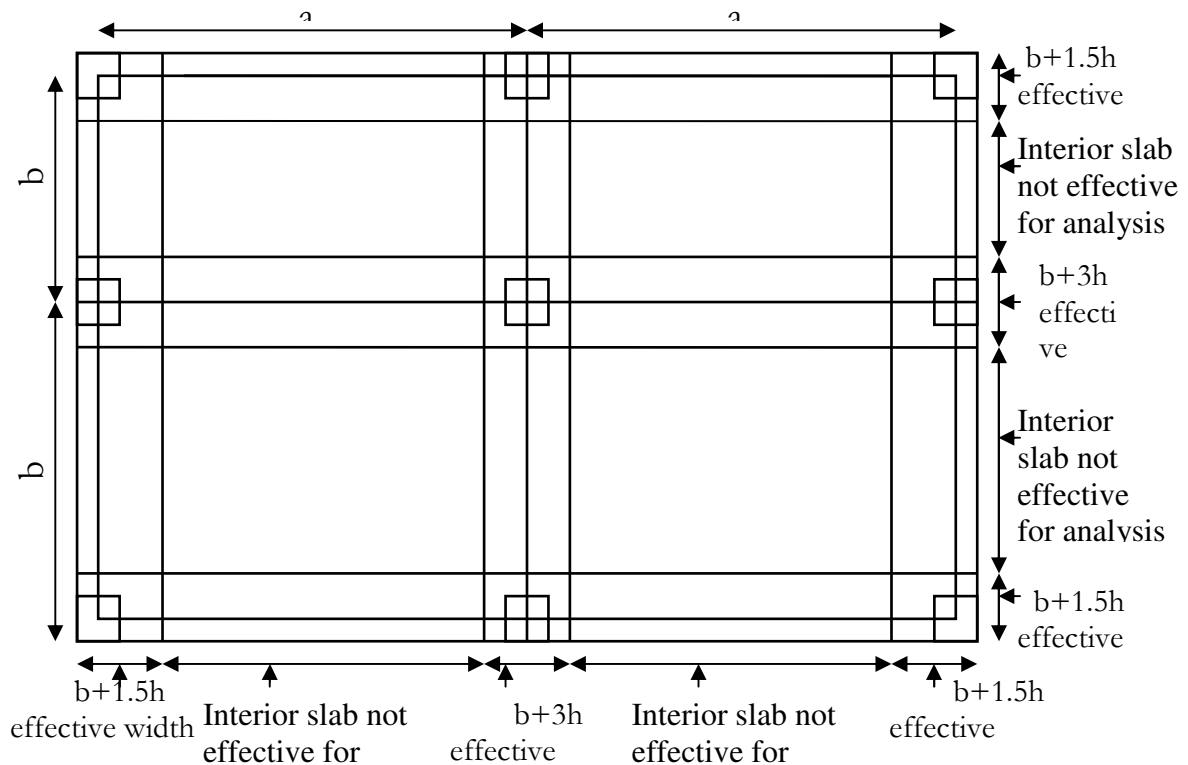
Plan of flat slab for effective slab width for lateral and vertical load carrying frame analysis.
